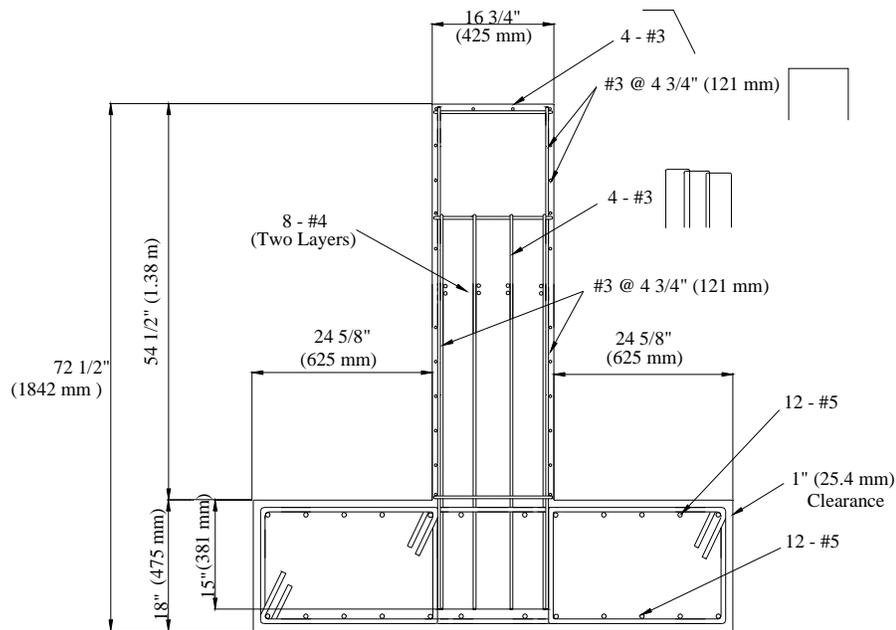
2- Reinforcement Layout (Section A-A)-Test Series IV
